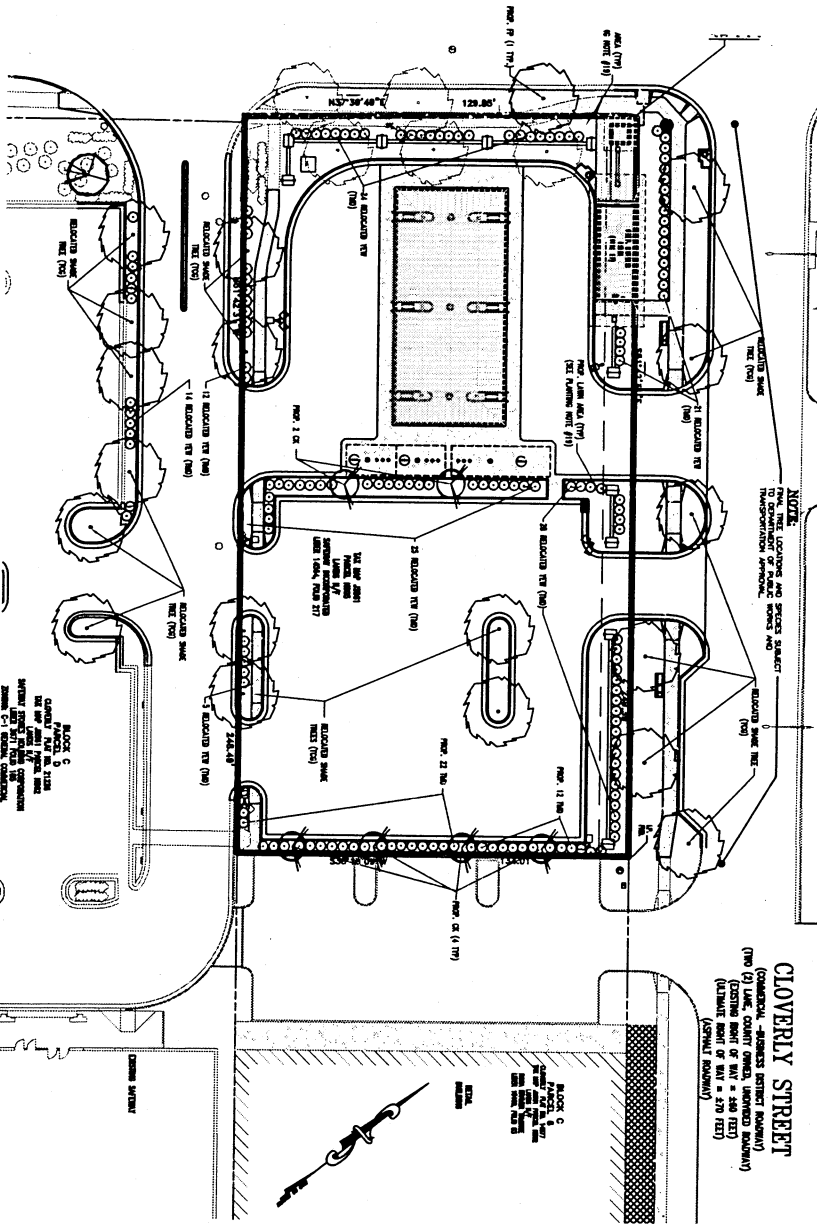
LAYOUT OF CONSTRUCTION WORK
